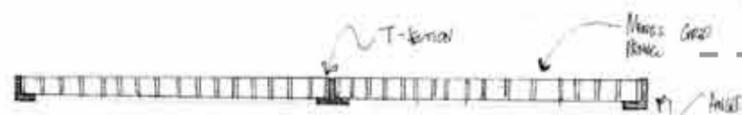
\_22.] Sketch collage of connection bridges, lightweight steel and mesh construction, pinned fixing on both support ends. Cavity mesh floor with services placed inside for easy access.
